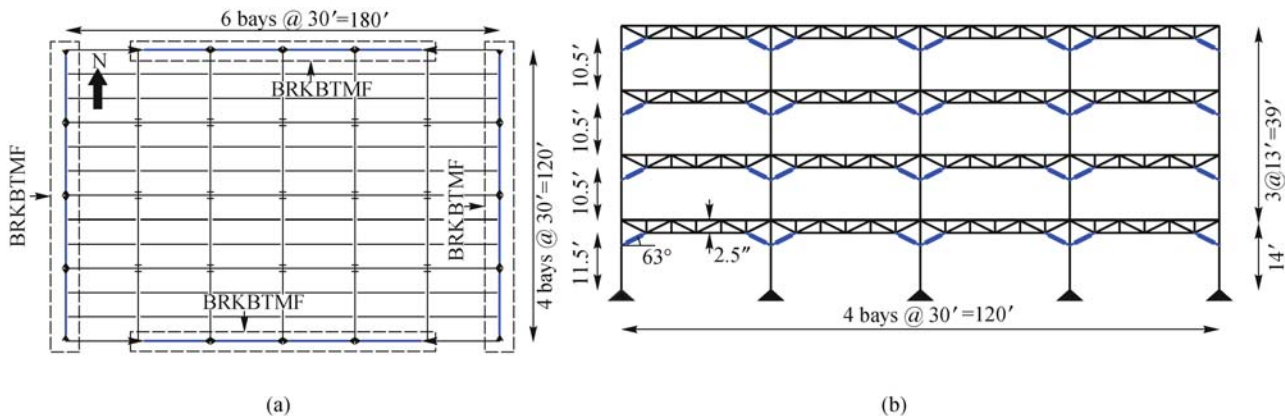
Prototype building geometry. (a) Floor plan; (b) elevation plan
